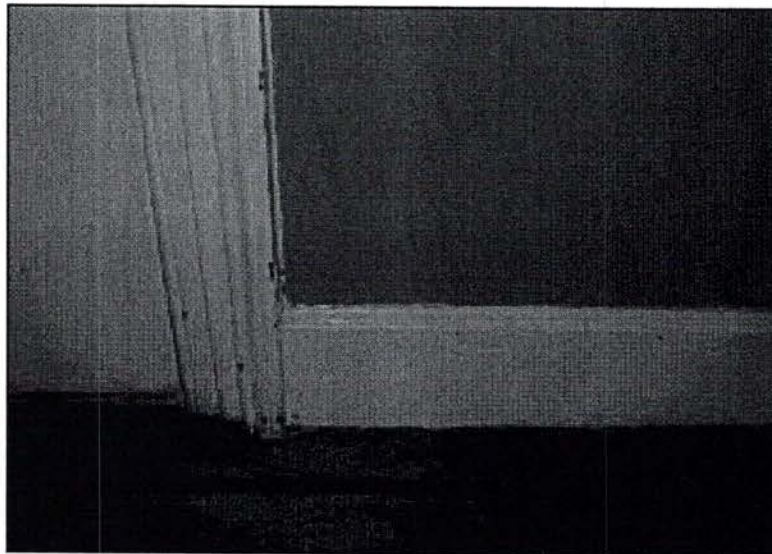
The baseboards and window moldings for Room 105 are not as elaborate as those found in the main section of the house.
